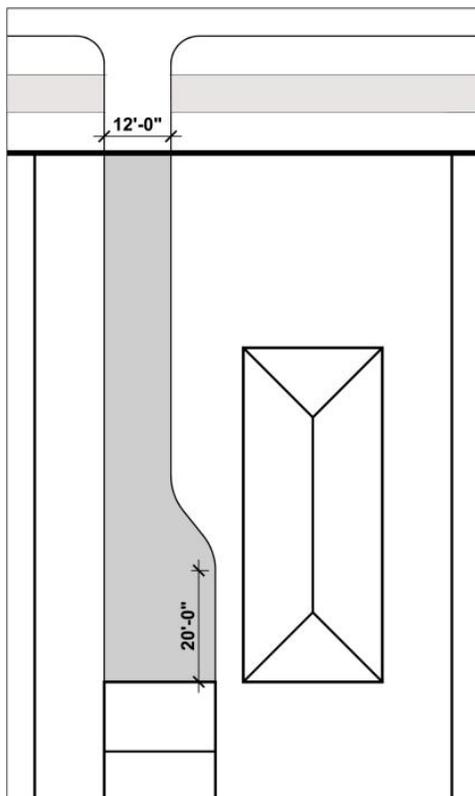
DRIVEWAY TO DETACHED GARAGE
